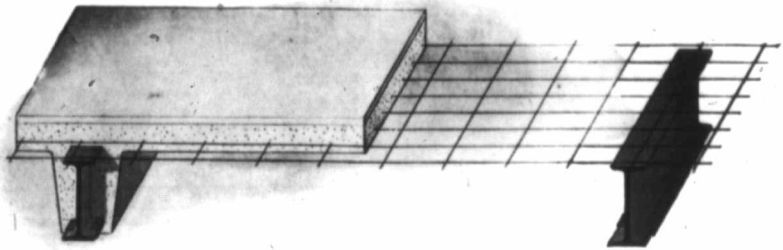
represents fire-proof construction of floor, reinforced with our Crimped Steel Wire Reinforcing, stretched on the top of I beams near the bottom of floor-slab.
